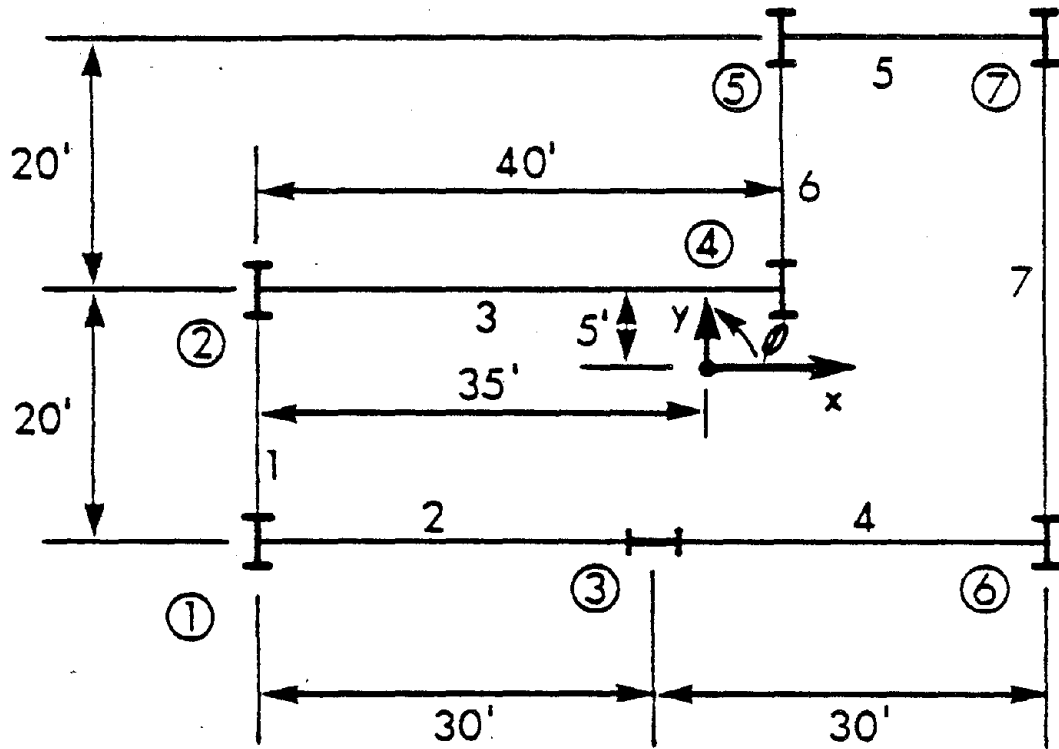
Five Story L-shaped Structure with Wide-flange Columns - Plan
